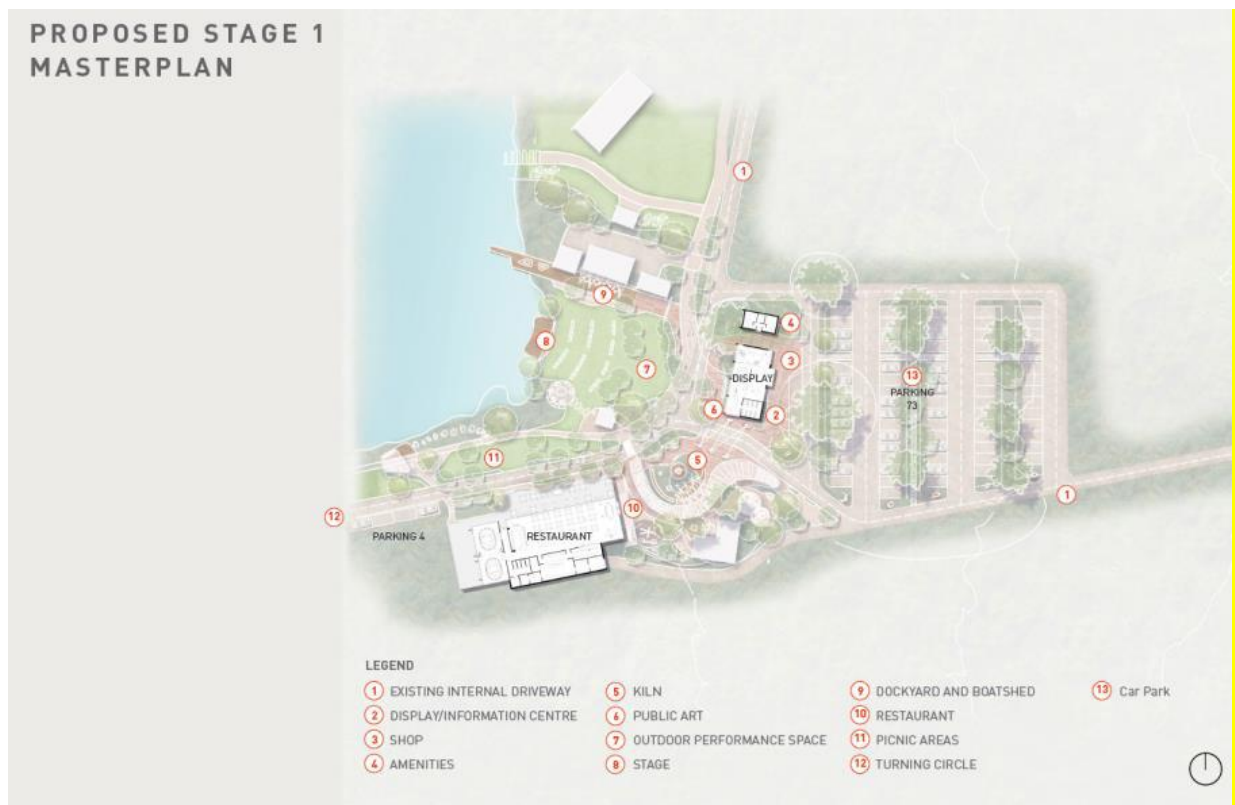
Proposed Stage 1 Masterplan – located to the south-east of the existing dam
